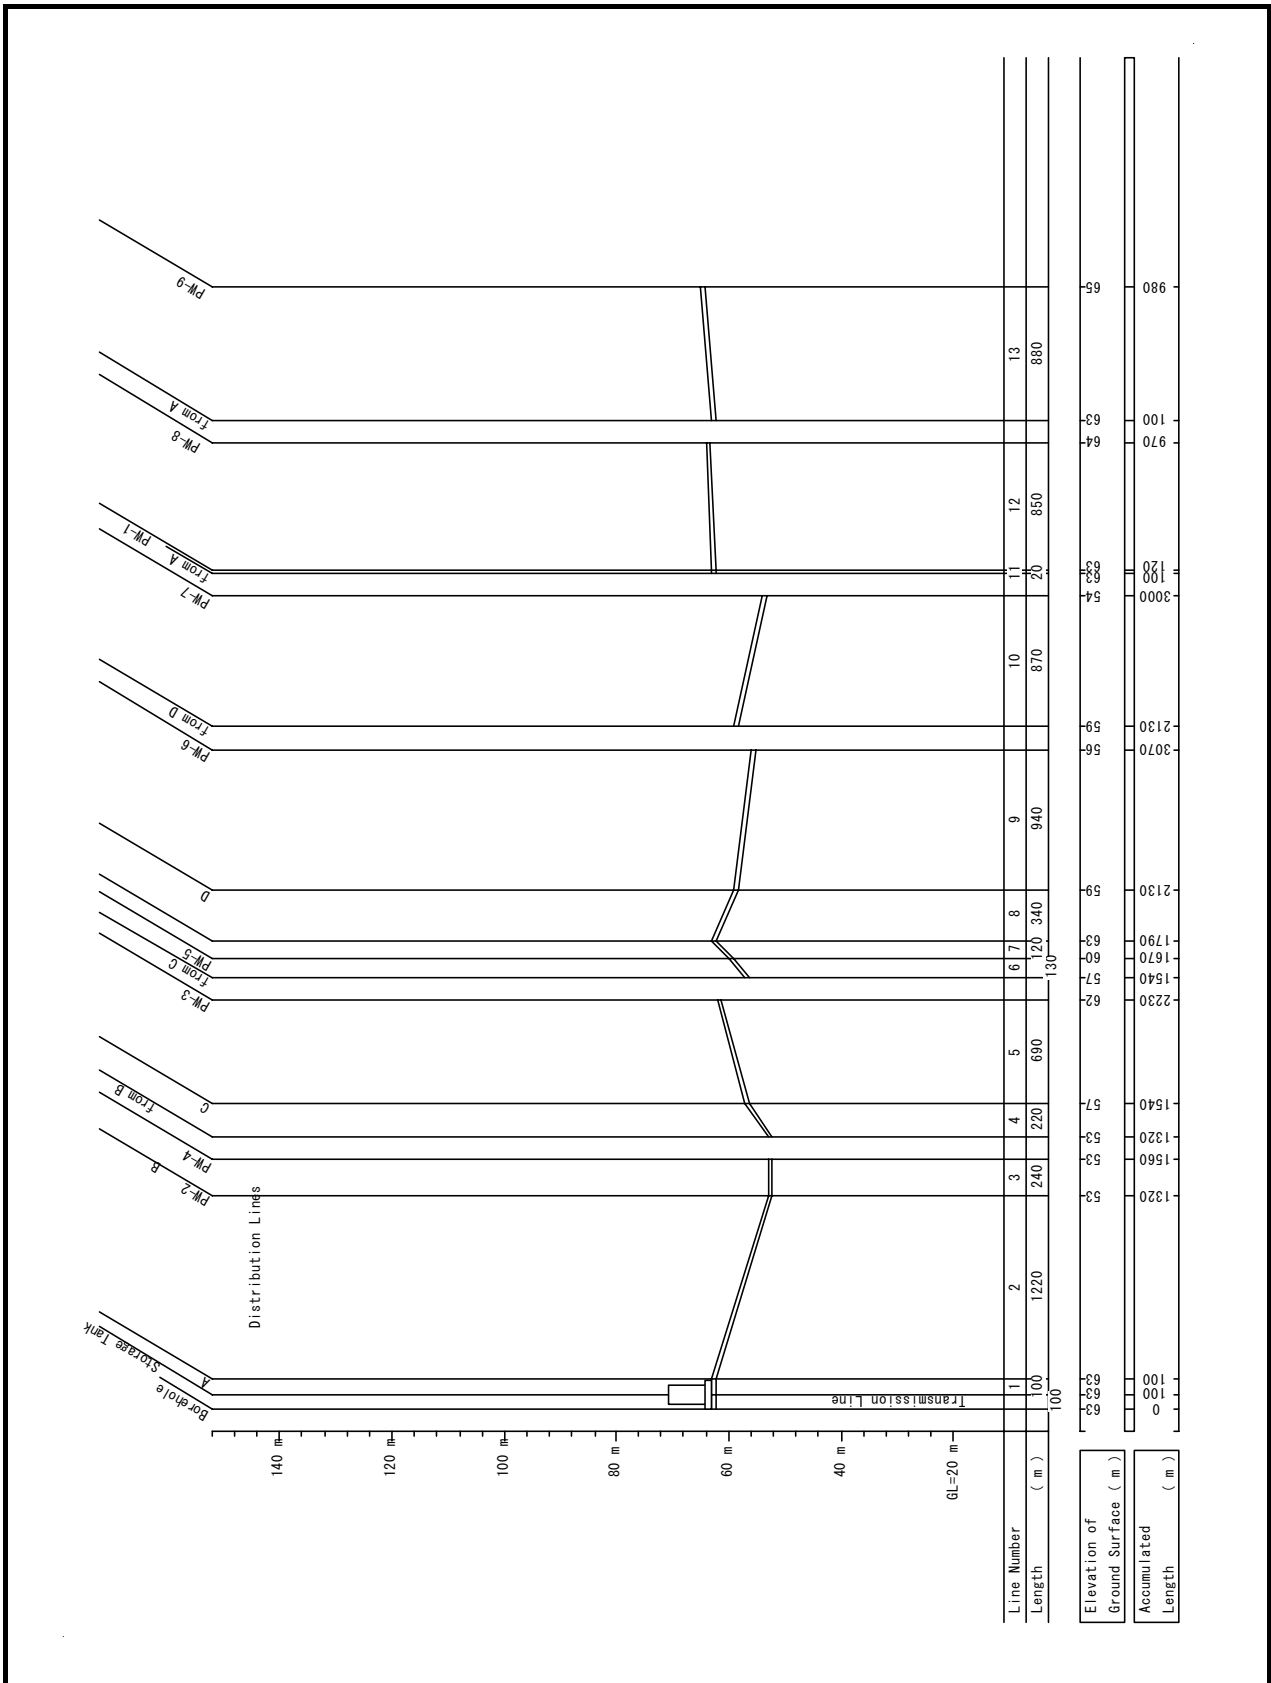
LONGITUDINAL SECTION (MZINGA: 15/22(1))
